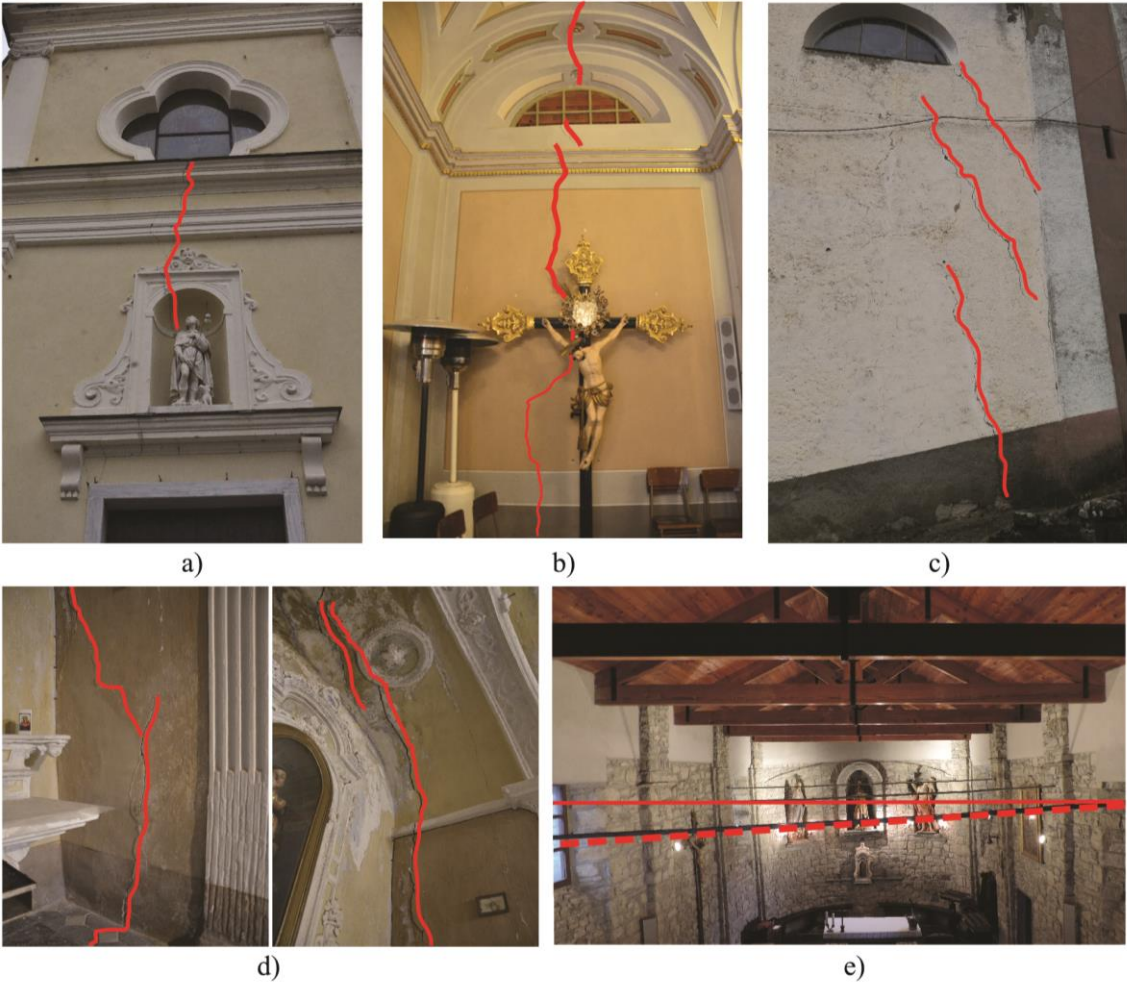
Damage and deformation in vertical element: a) cracks in the façade wall next to openings (CH\_3c) cracks in the apse wall between openings (CH\_28), b) vertical cracks in longitudinal walls propagating from the
